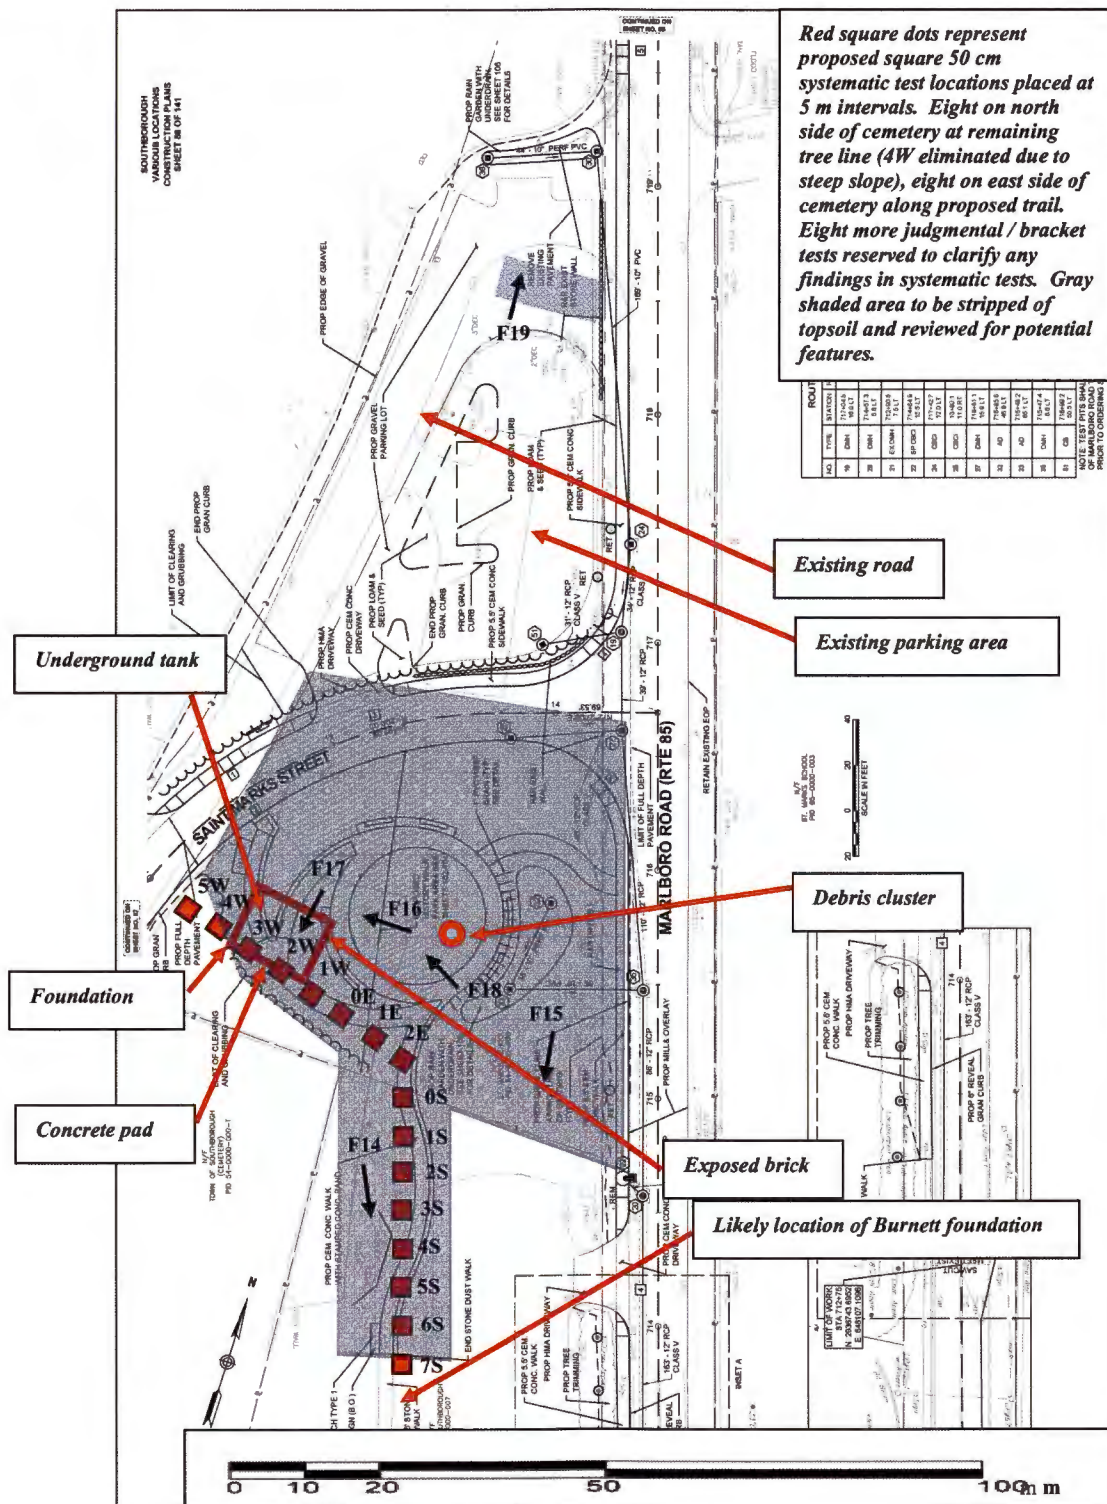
Site Plan and Testing Pattern. 1:1,000 scale.
